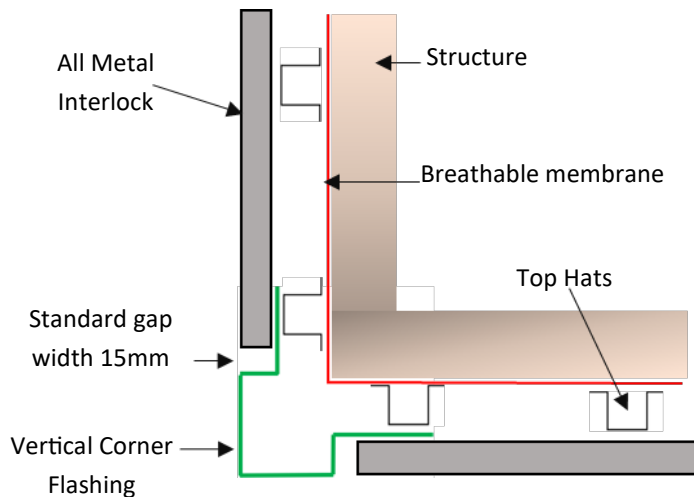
All Metal Interlock Panel folded to suit corner dimensions
